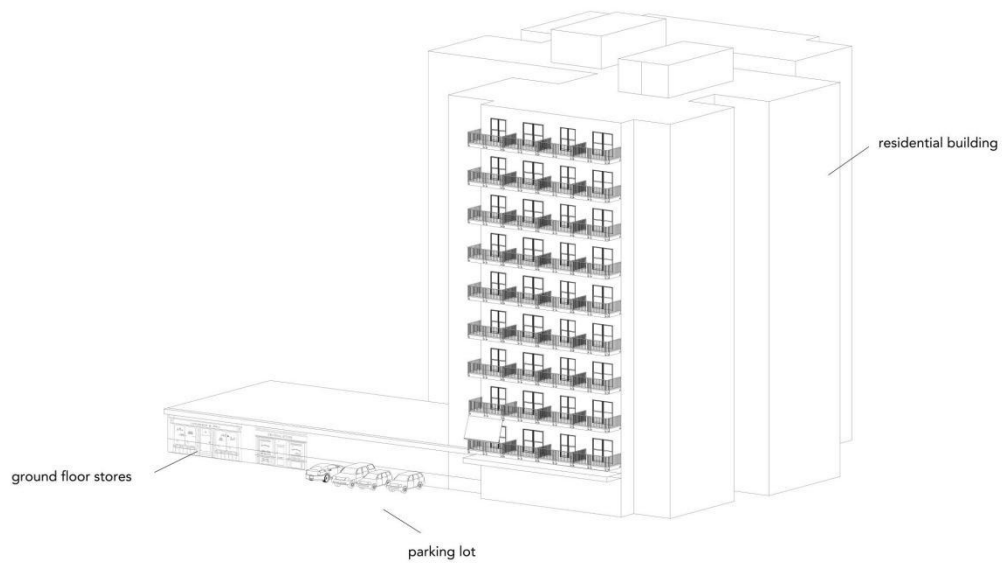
Illustrations of “Da-me” building of zone E11. Made by author.
